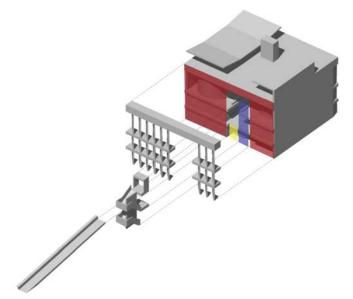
Elements of the front façade of the Mill Owners' Association Building (Source: Author)
